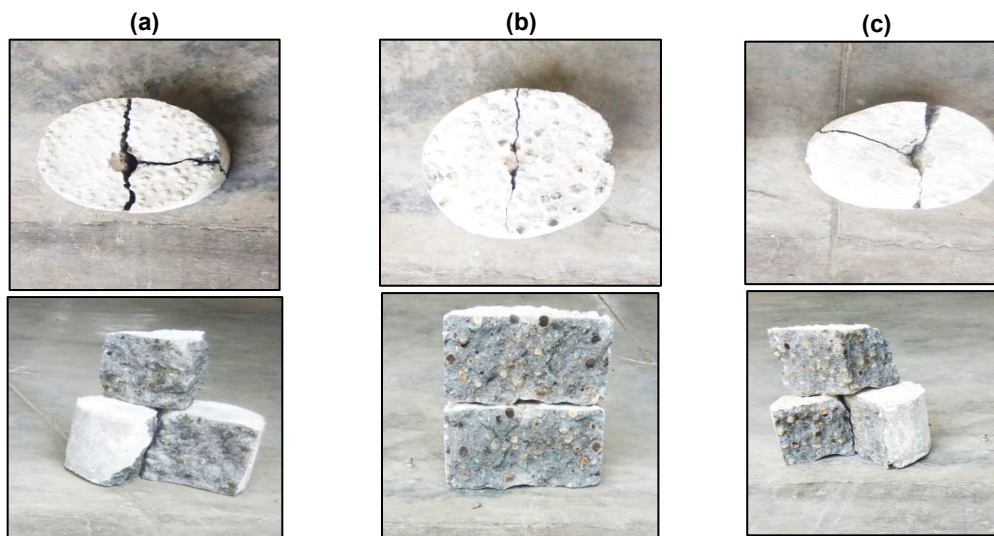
Failure modes of tested concrete mix with varying SFA (a) 0 % (b) 50 % (c) 100 %
